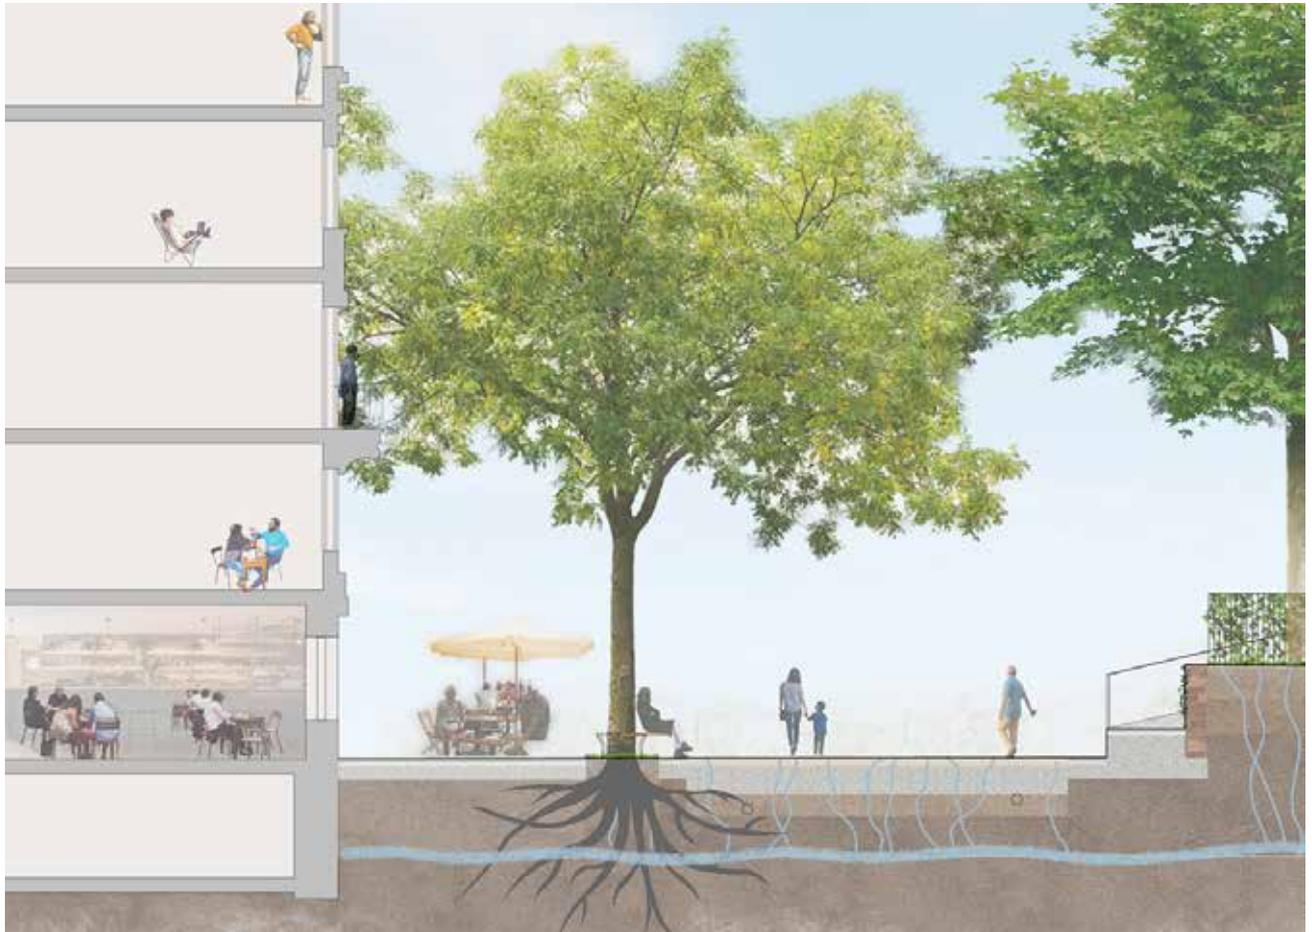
Detail Section Porous Concrete - Detail Schnitt Permeabler Beton
